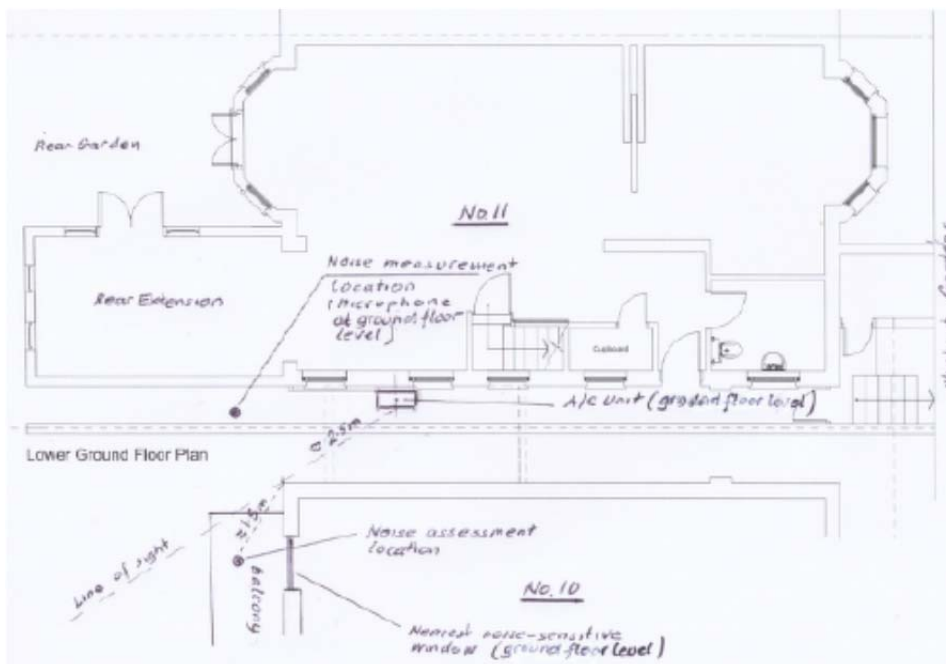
Ground floor plan showing the noise measurement and assessment locations
